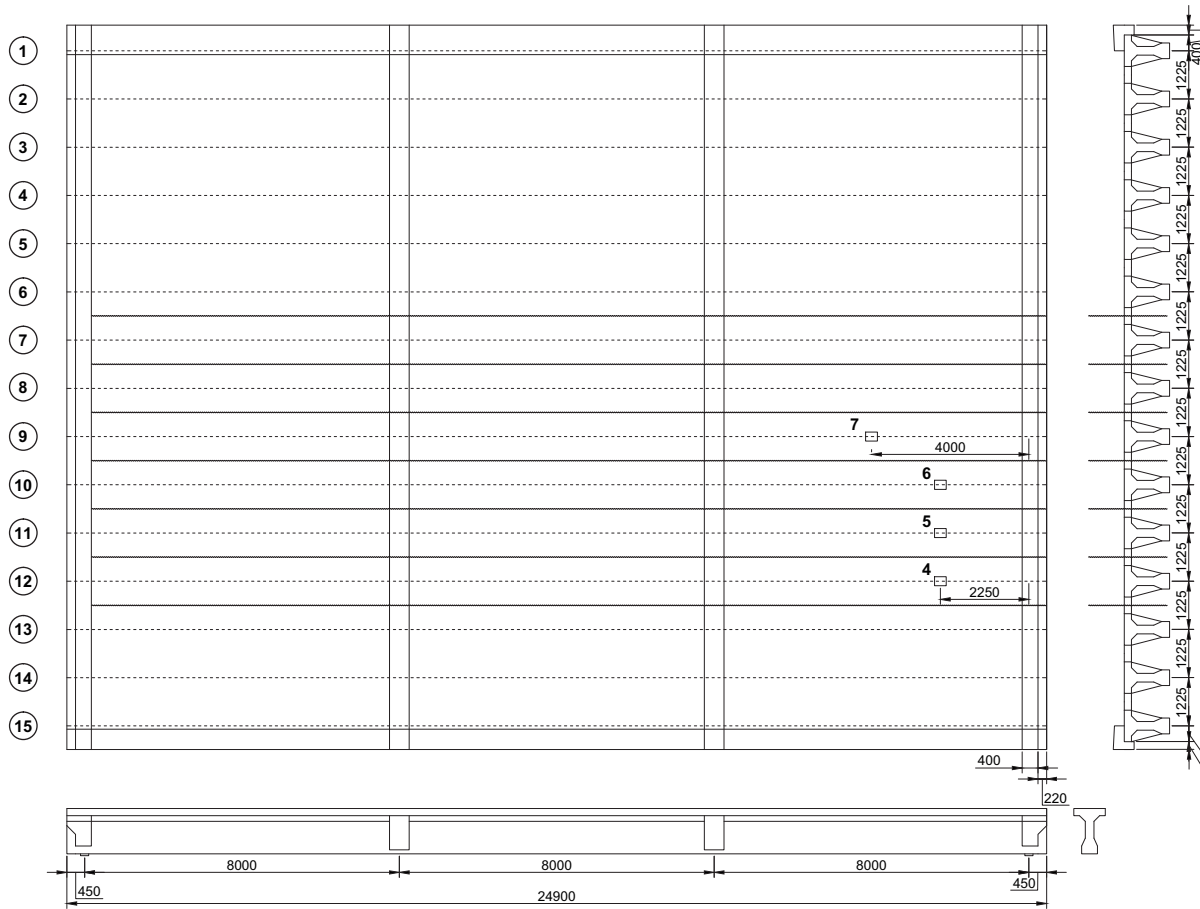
Top and side view of span 2, test locations for test 4, 5, 6 and 7 with cutting lines
